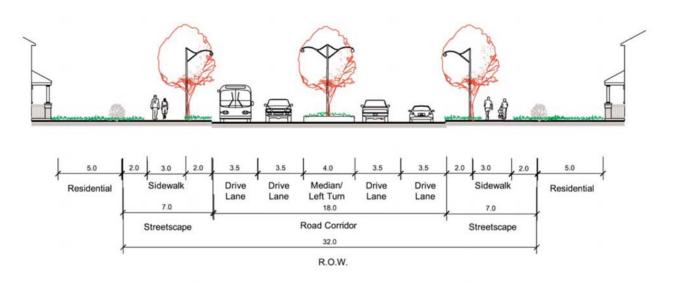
THE QUEENSWAY, KSP PROPOSED CROSS-SECTION (RAVENSHOE ROAD TO PINE BEACH DRIVE)
